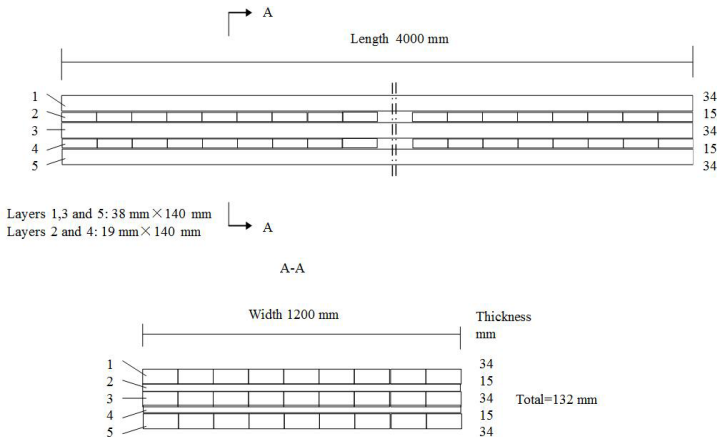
The lay-up structure of prototype hem-fir CLT panel.
